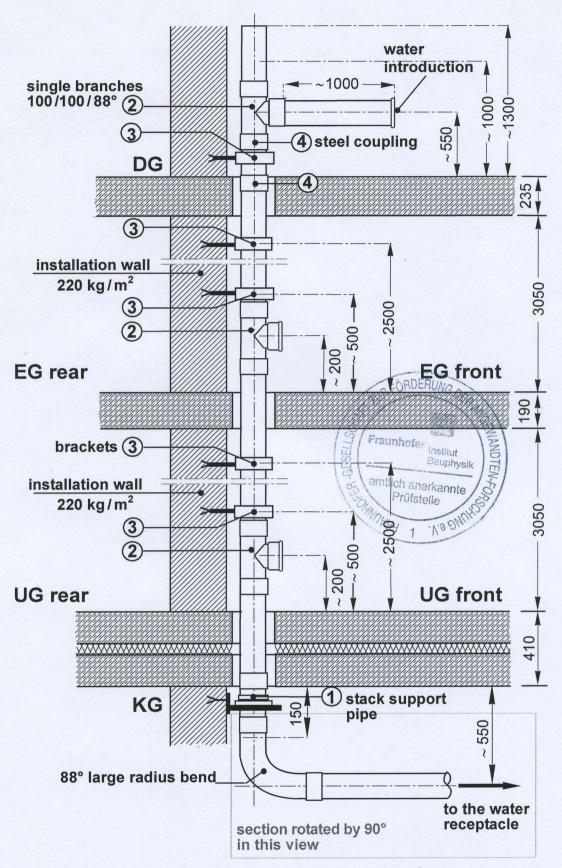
Installation plan of the Wastewater systems I, II and III: "SMU®", manufacturer SAINT-GOBAIN PAM, with different brackets (drawing not to scale, dimensions in mm).
